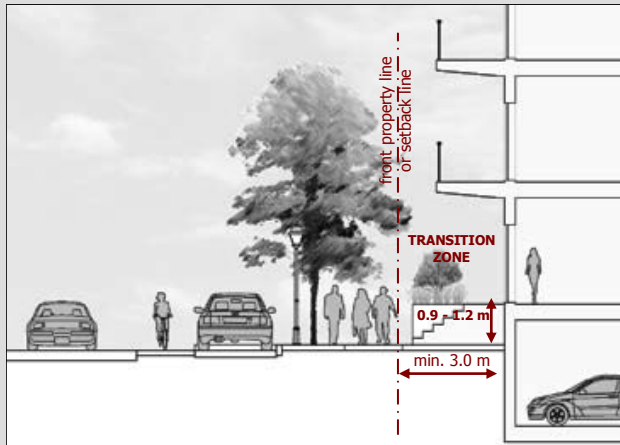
Approach I: Residential uses are elevated above the ground floor, but directly linked to the public sidewalk through individual points of access serving each unit.
